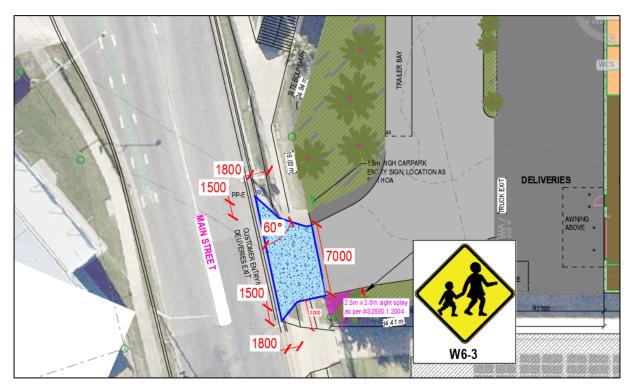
PROPOSED ACCESS ARRANGEMENTS OFF MAIN STEET
